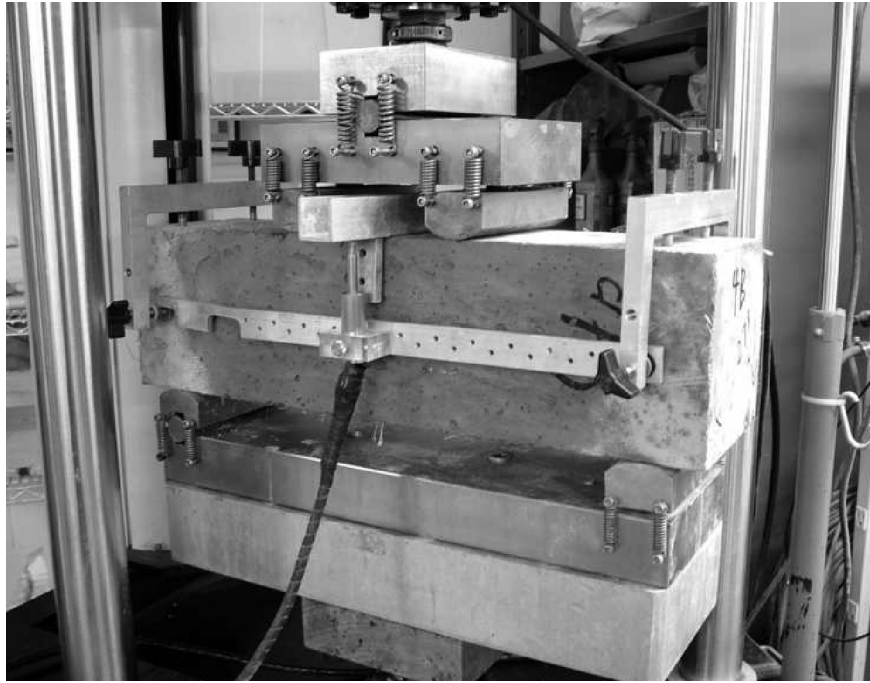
Arrangement to Obtain Net Deflection by Using Two Transducers Mounted on Jig Secured to Specimen Directly Above Supports
